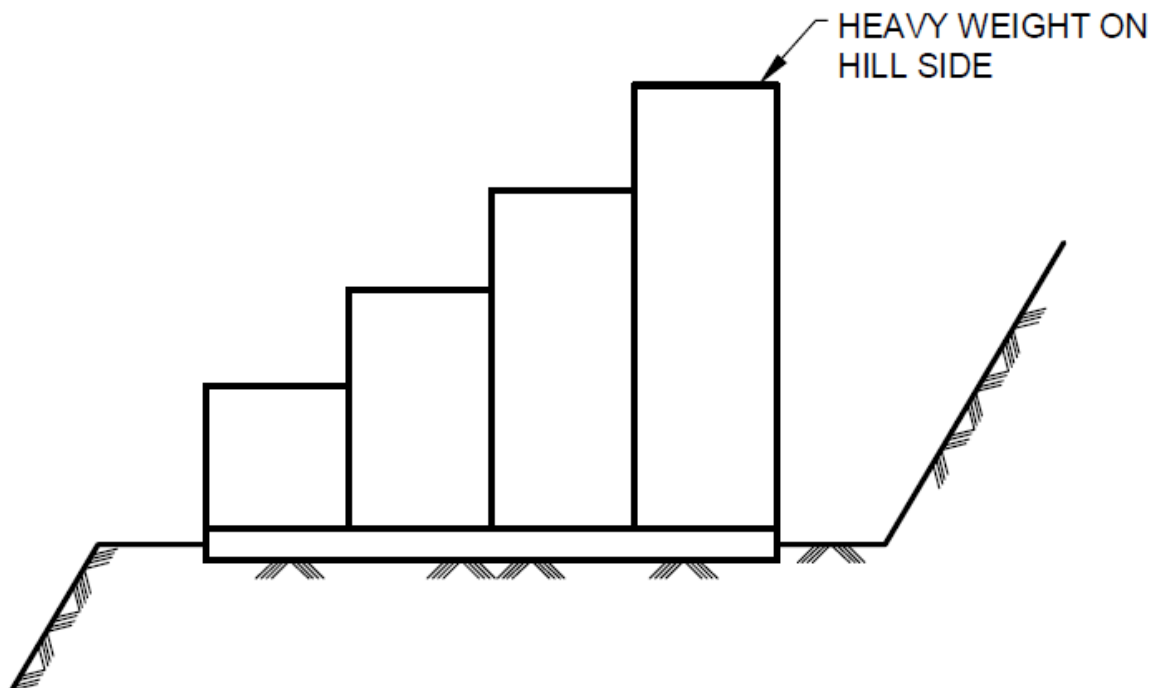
RAFT FOUNDATION ADJACENT TO HILL SLOPES
